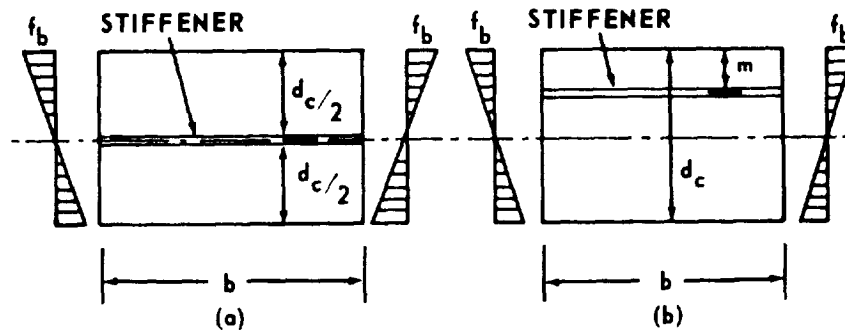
POSITIONS OF LONGITUDINAL STIFFENERS
